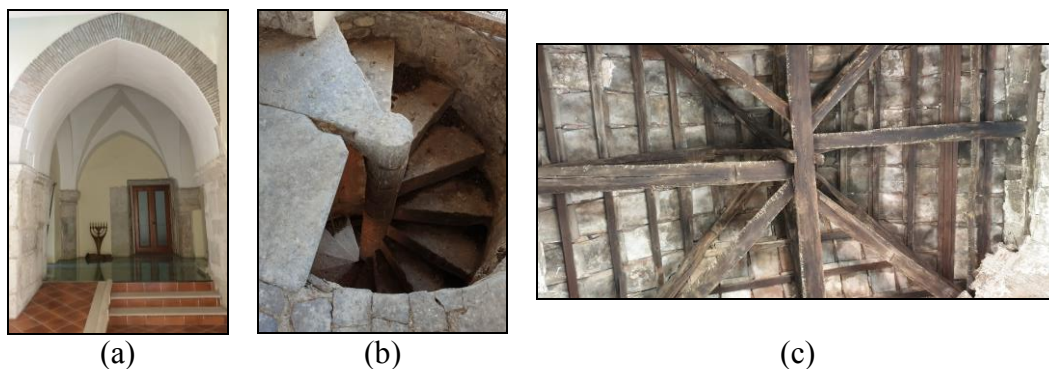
(a) Vault with a pointed arch; (b) spiral stone staircase; (c) wooden roof with ancient tiles.
